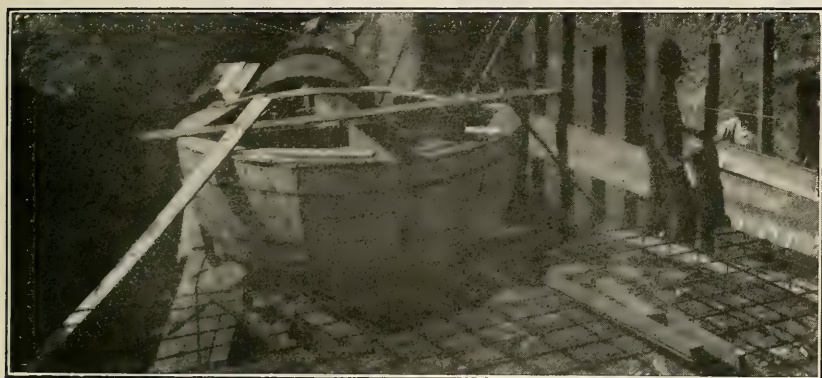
FORM FOR BOWL, FLOOR REINFORCEMENT, AND CAST-IRON PIPE FOR INLET SECTION FOR STRUCTURE IN FIGURES 1 AND 3.
